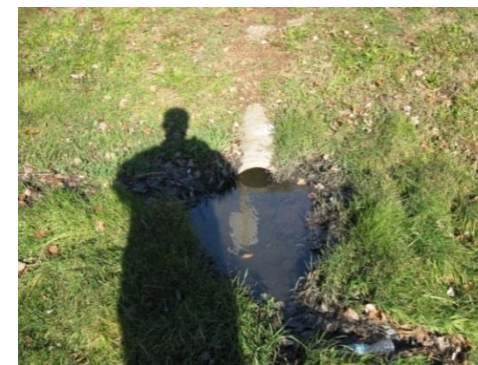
Trafalgar Road West Side Storm Sewer Outlet to Ditch
